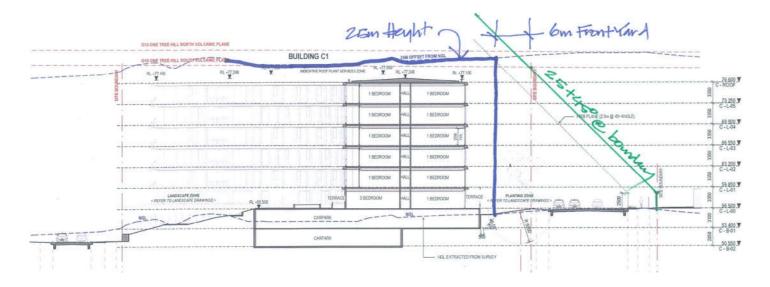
Section through Building C1 showing Ladies Mile and opposite houses.
